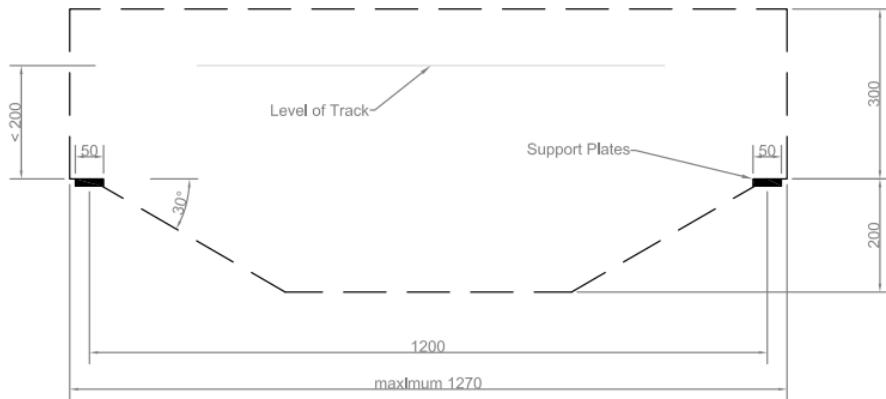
Dimensional constraints of the bridge shown in an elevation view.
